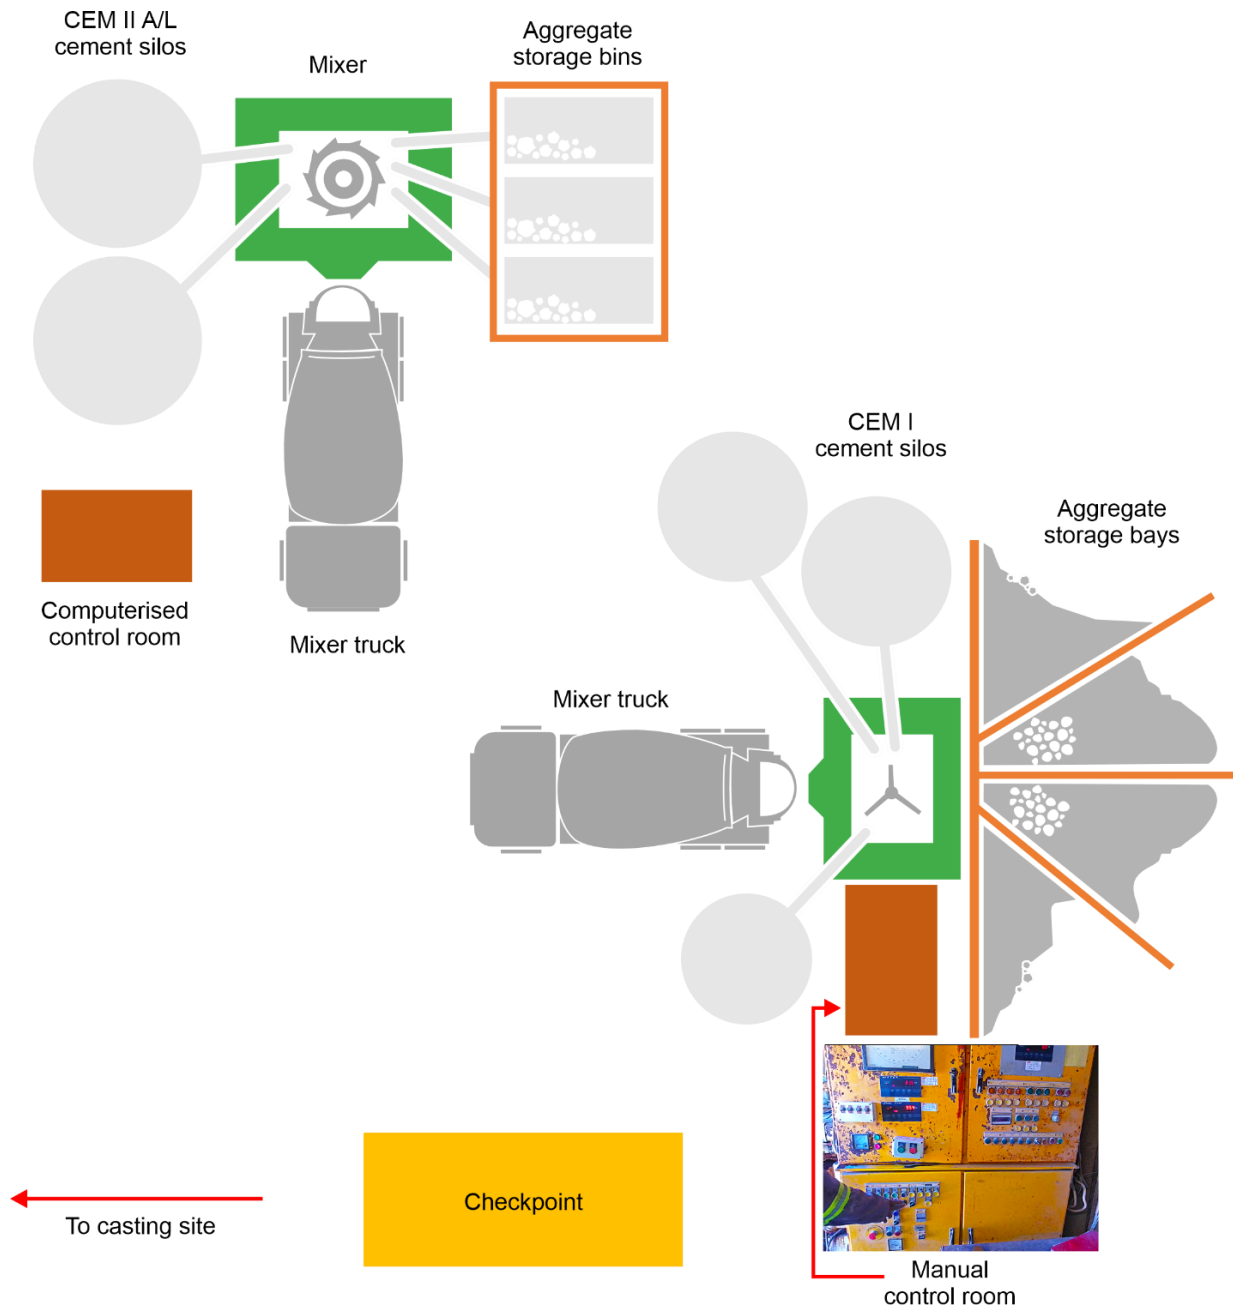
Schematic plan view of the plant used for batching and mixing of the concrete mixes used in the study.
